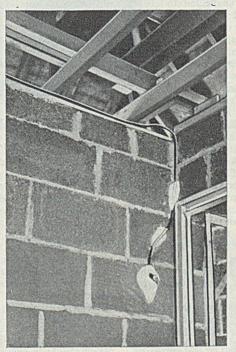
Flexible conduit run under joists to avoid slotting and in wall angle to dispense with chasing
